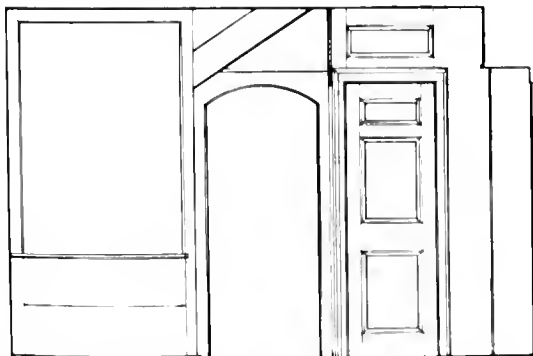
East Hall, West Elevation This wall is also of several levels. The left side lies against the stairway and is the typical horizontal beaded board. The section further back is the passage into the west hallway. Again, this wall is complicated due to the slope of the stairway to the second floor. The section to the right is the small area containing the door to the lavatory and the north door to the outside terrace. (Drawings surveyed and adapted from Oker prints)
